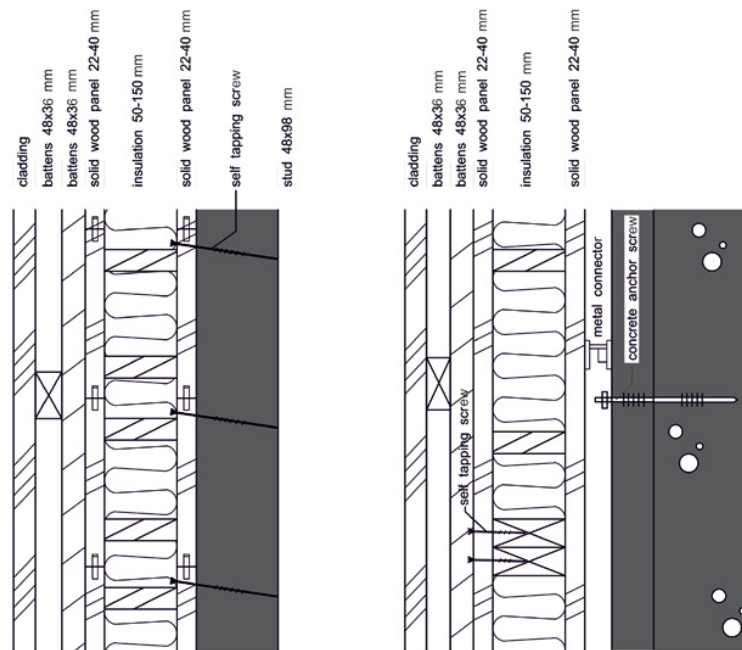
The patented system solution depending on material in the building being refurbished. A) Vertical cross-section with wood b) Vertical cross-section with concrete
